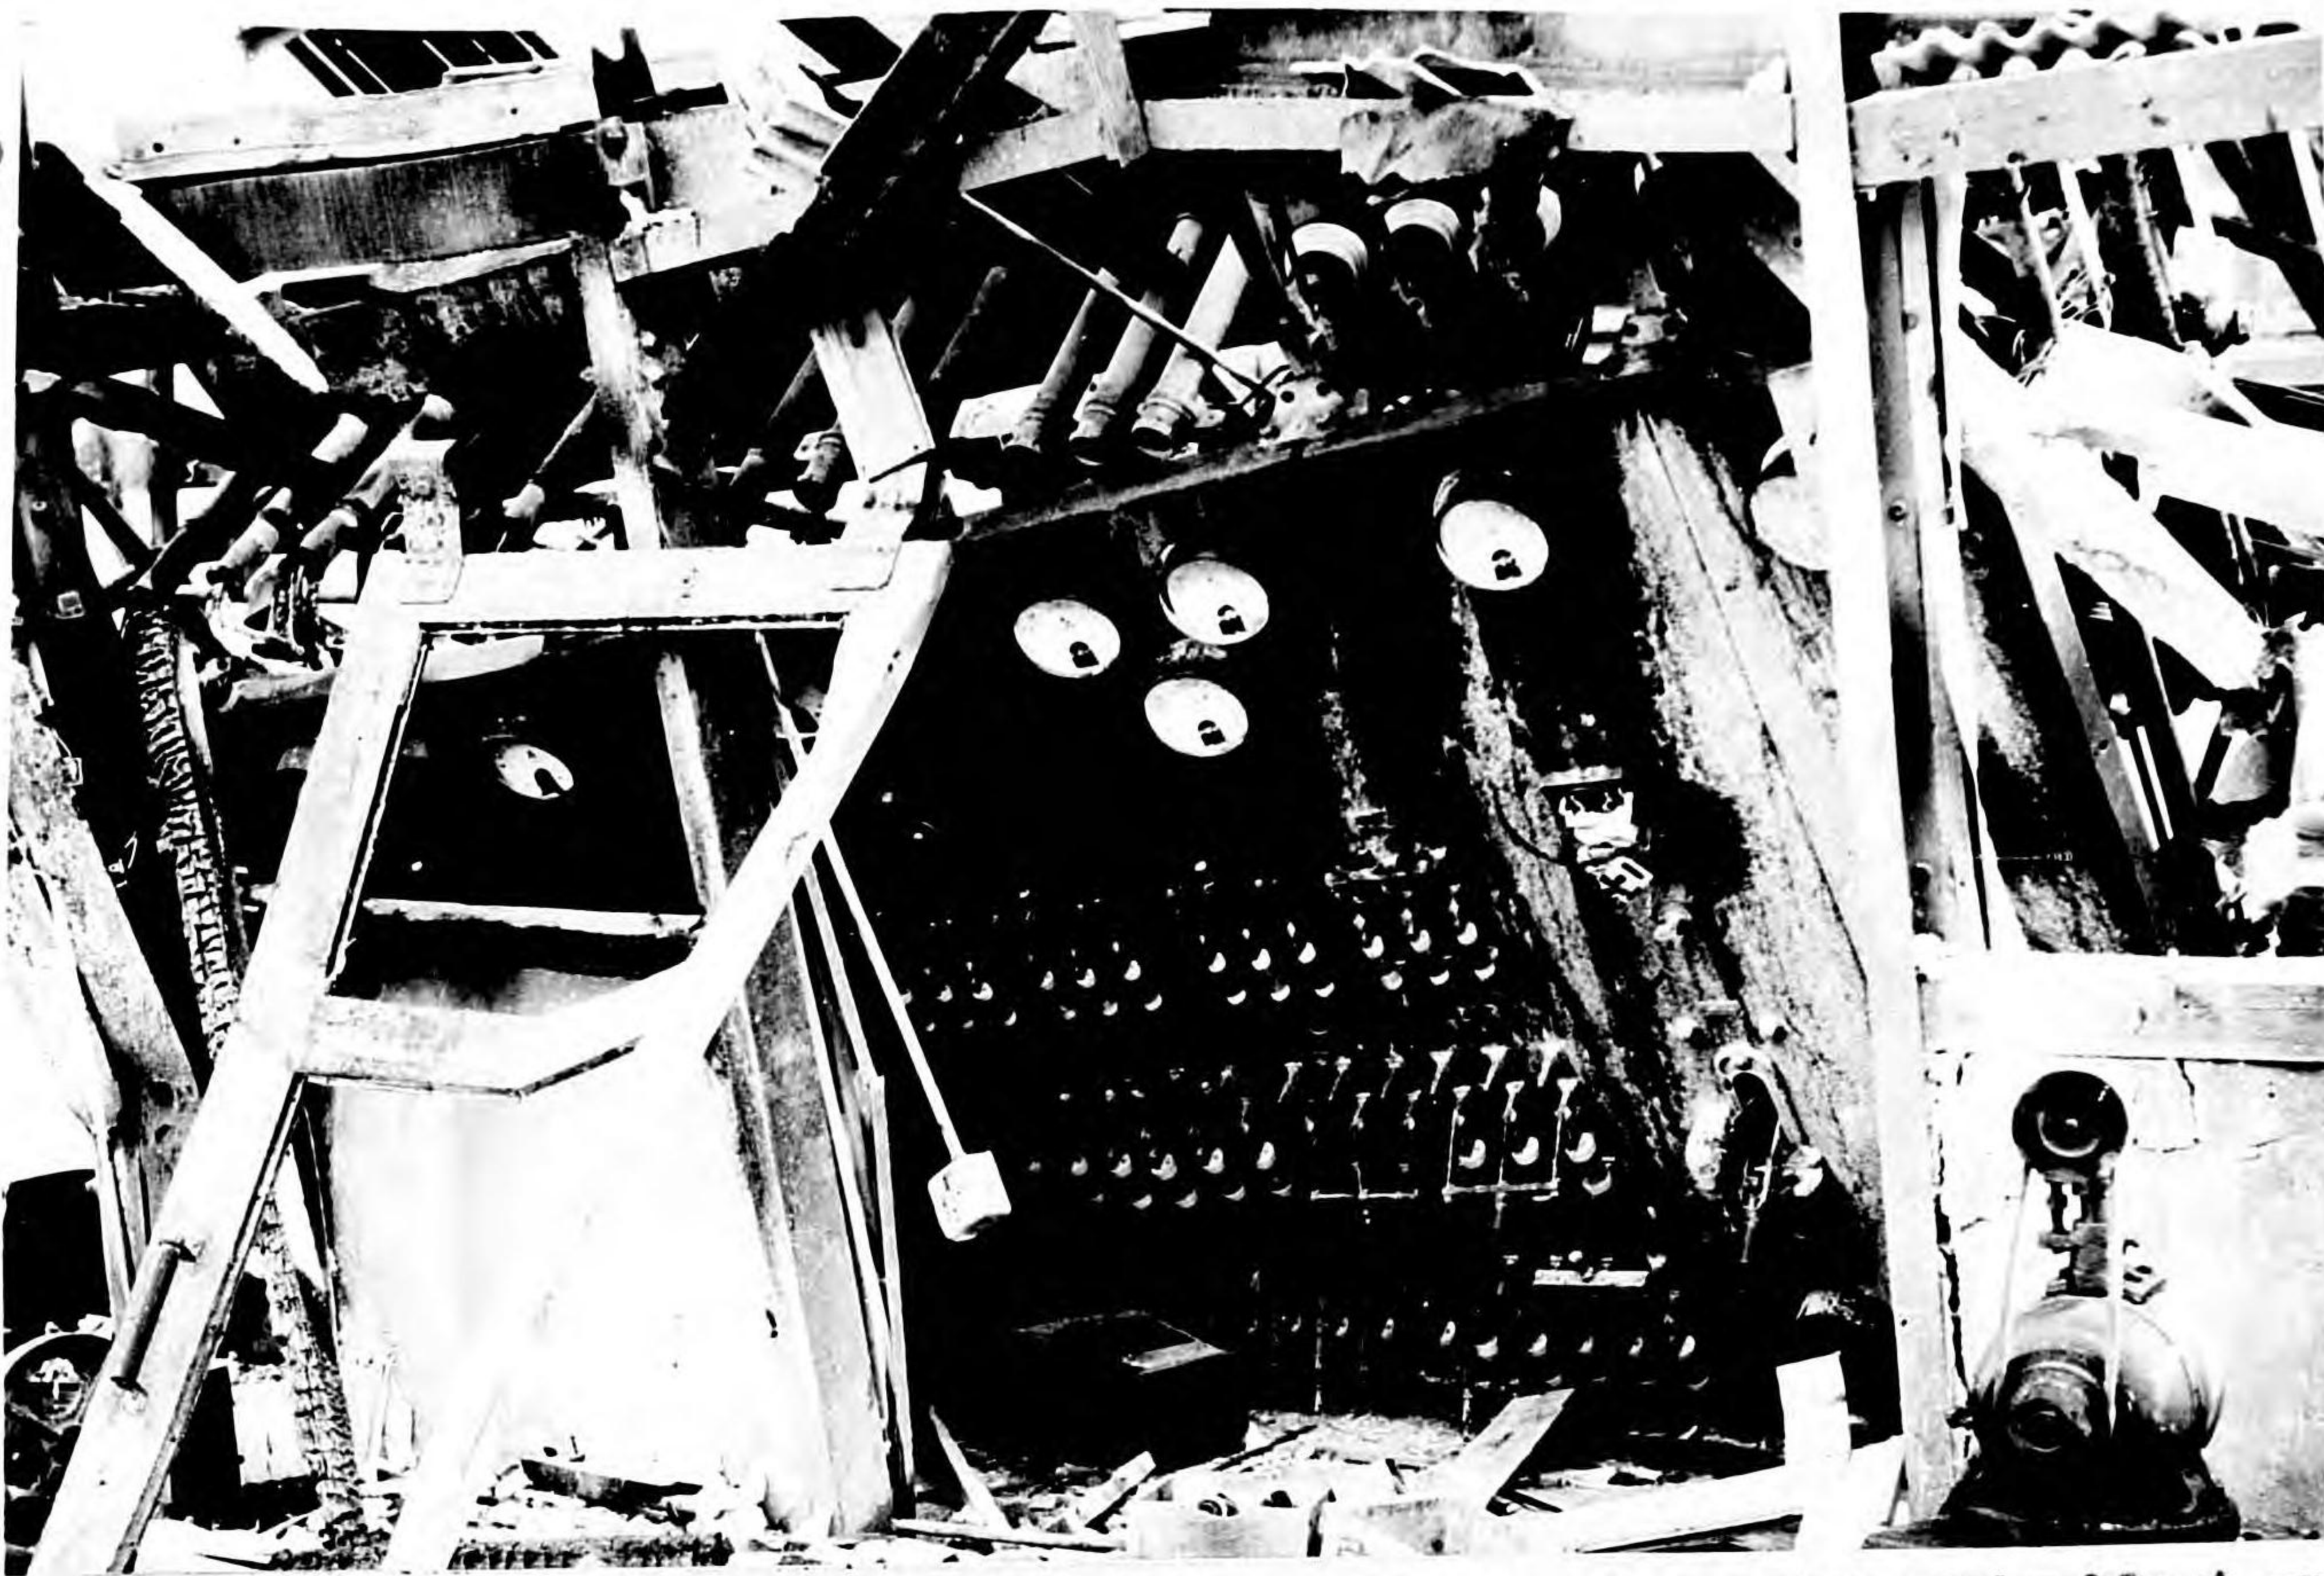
Nagasaki, 5,000 feet from GZ. Switchboard overturned by blast and damaged by fire.
